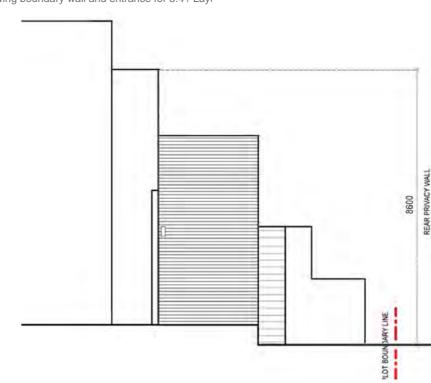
Right Elevation (Canal side) showing boundary wall for 5.4 / Layl Applicable for Inner Canal Villas
